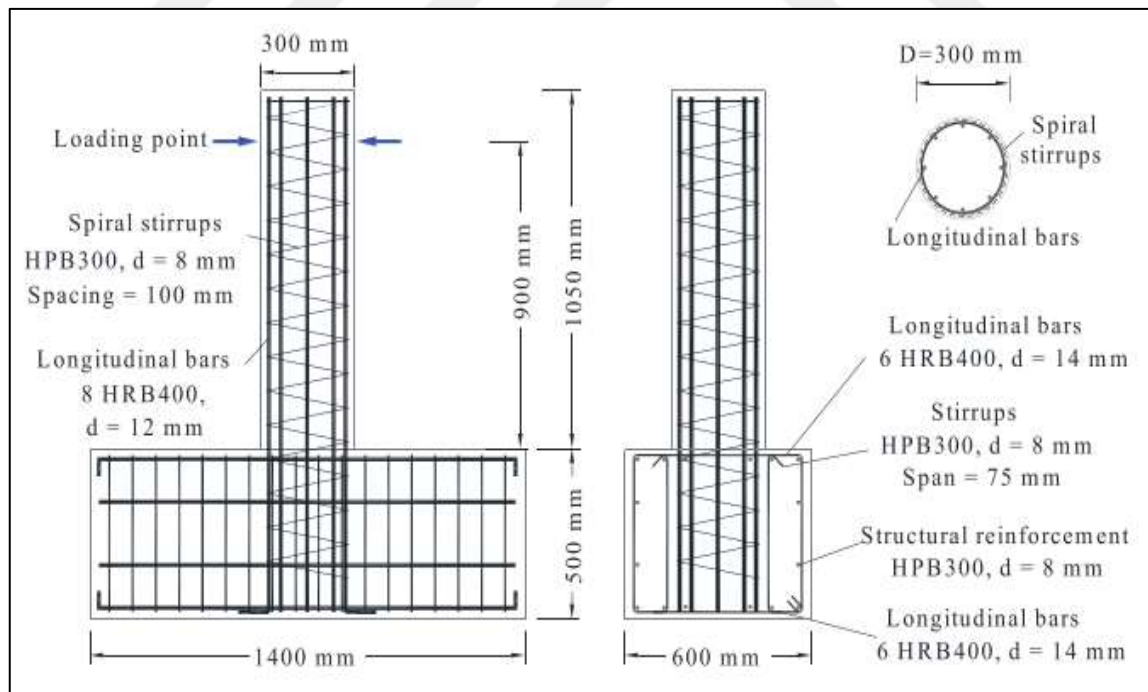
Dimensions and Reinforcement Details of Specimens (unit: mm)[15].
